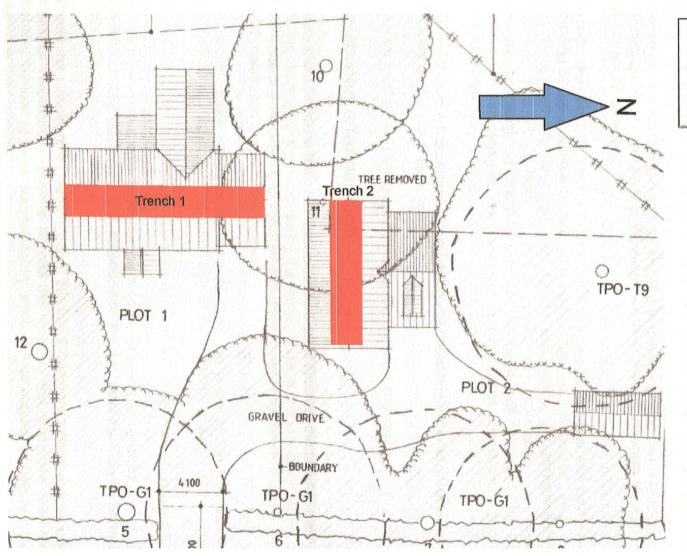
Plan of proposed layout of trial trenches, at original scale of 1:200
